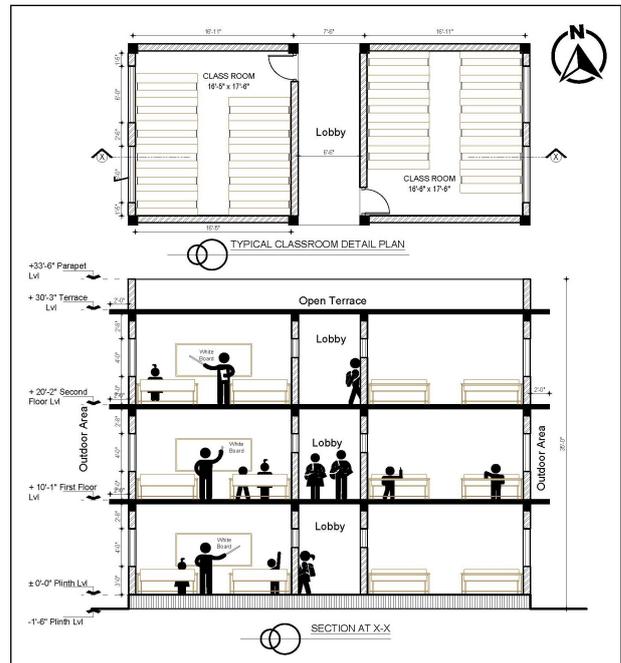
Typical Classrooms floor plan and Detail section of Gyanodaya Secondary School
